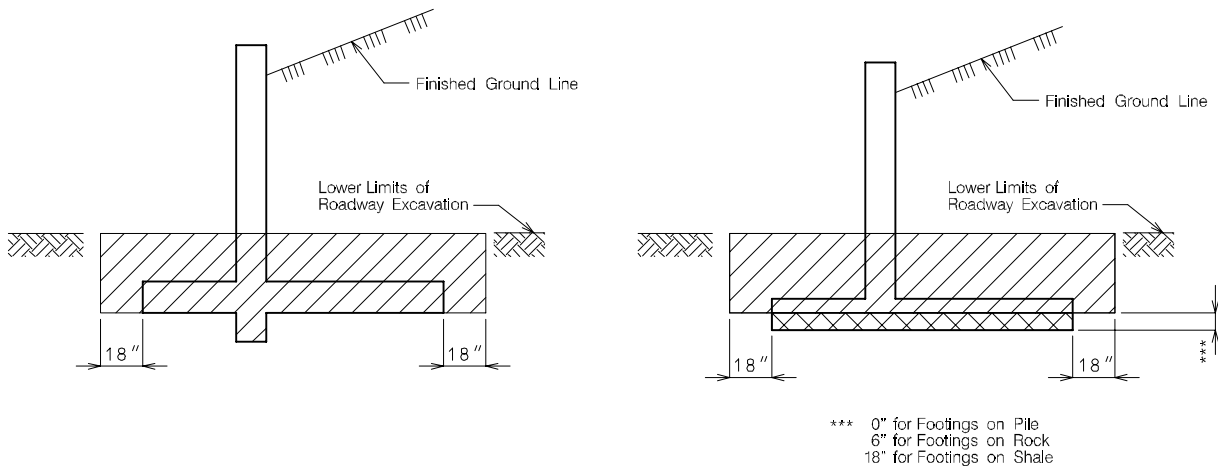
Excavation Limits: Stream Crossing
